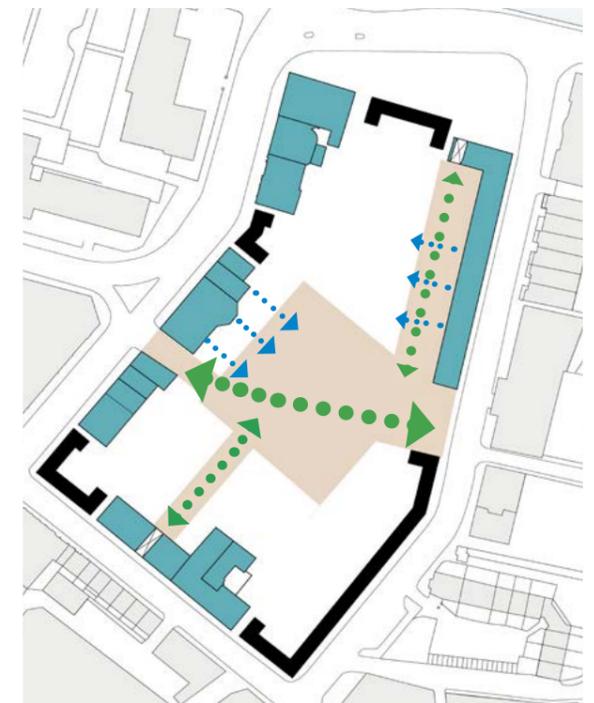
Prominent existing elevations will address and characterise the new public space.
